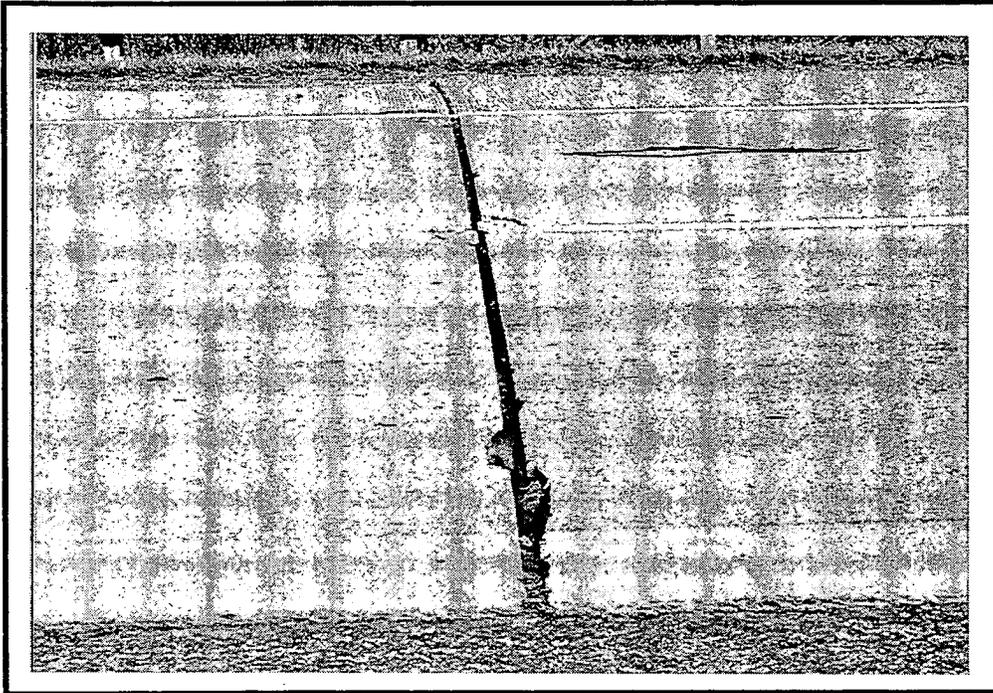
Joint Sealant Damage in Jointed Concrete Pavement
